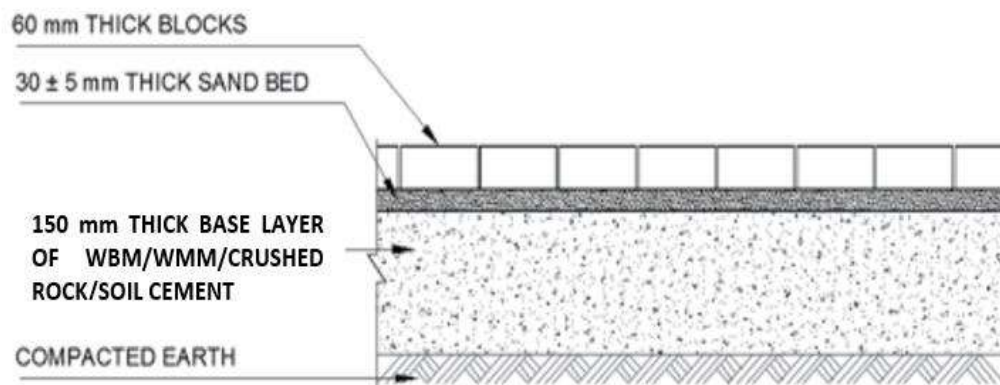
Typical Cross Section of Block Pavement used in Sidewalks /Footpaths/Car-parks /Cycle Tracks
